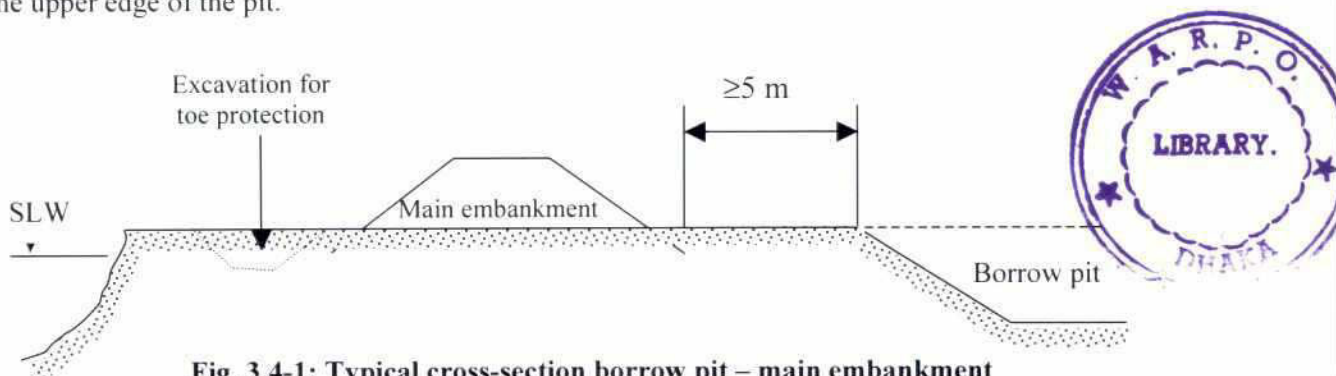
Typical cross-section borrow pit – main embankment
